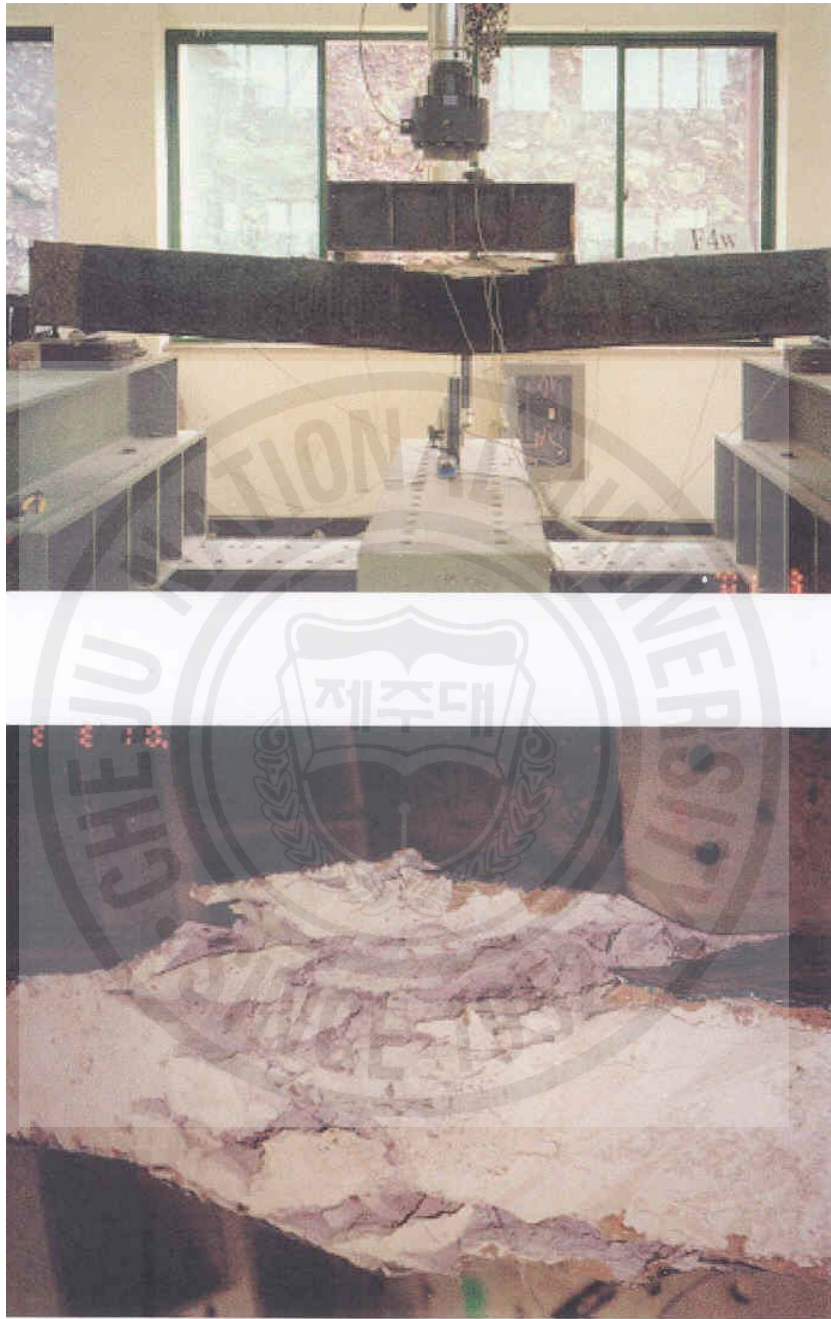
Concrete compression failure of 4-layers CFRP sheet with web anchorage
